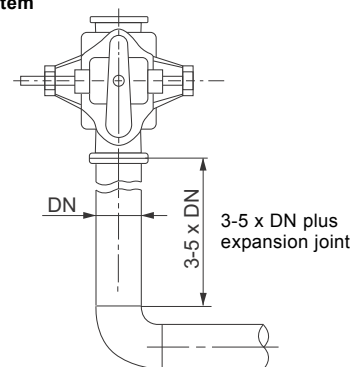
Recommended inlet pipe installation with a length of straight pipe between horizontal elbow and pump
